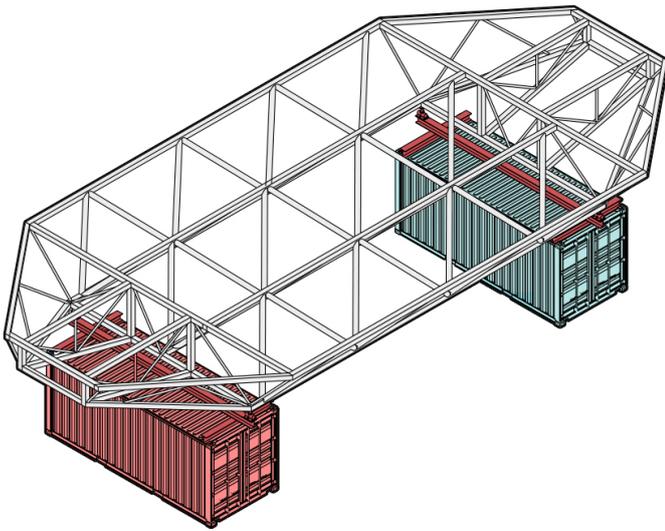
Module of structure construction- stage 1 The module raised on containers to allow hydraulic legs and skis to be installed. Original author
